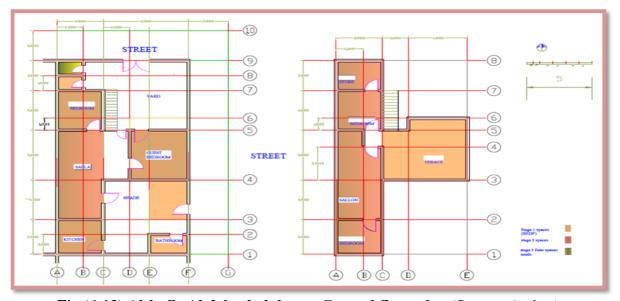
Alshafie Abdelwahab house Ground floor plan (Source: Author)
